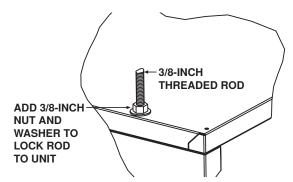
Unit Suspension Using Field-Supplied Threaded Rods
